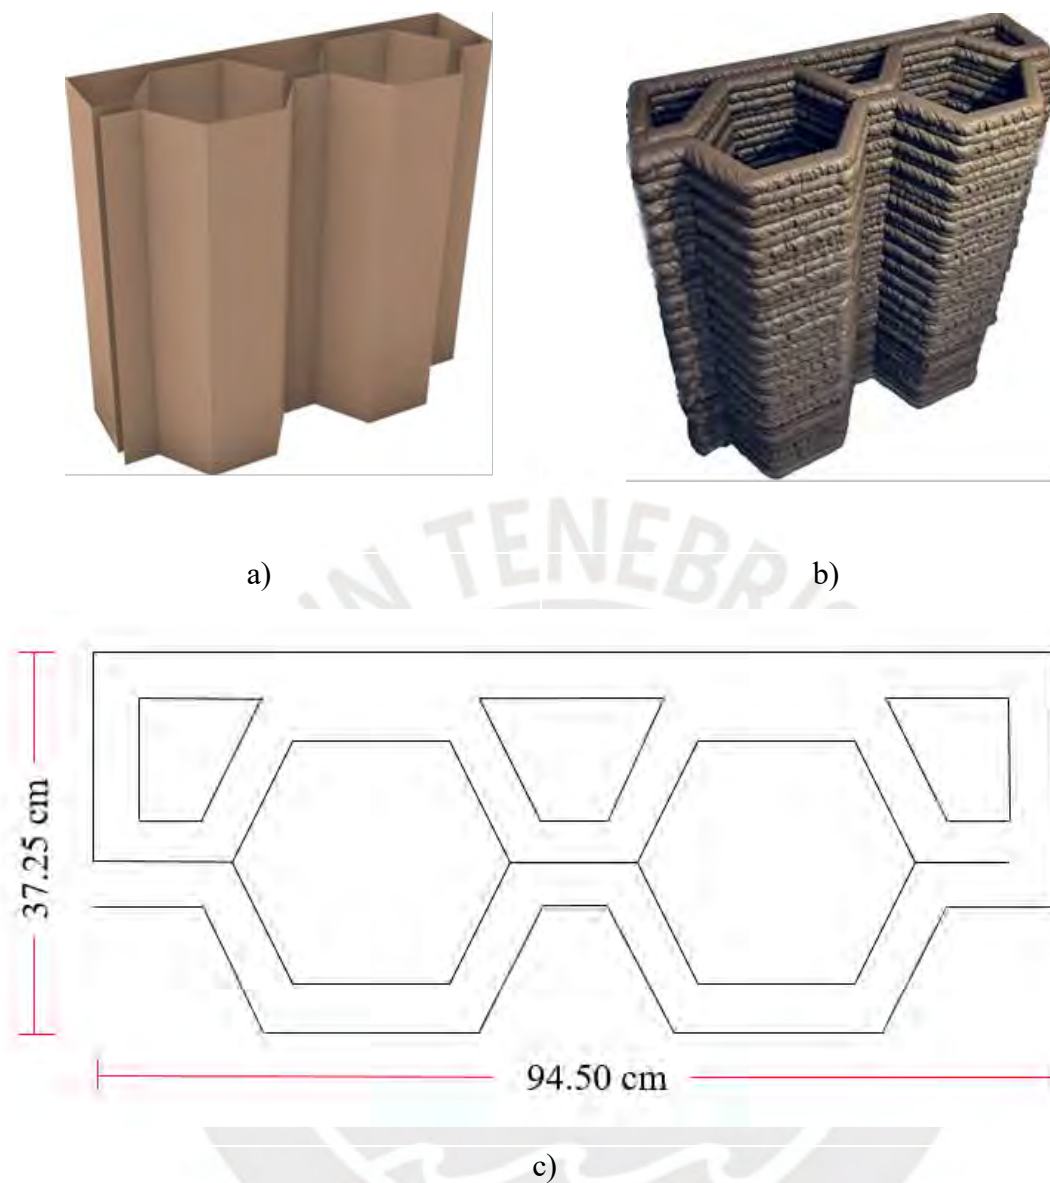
Medium-scale 3d printing of soil-cement a) rendered, b) real, and c) its plan view.
